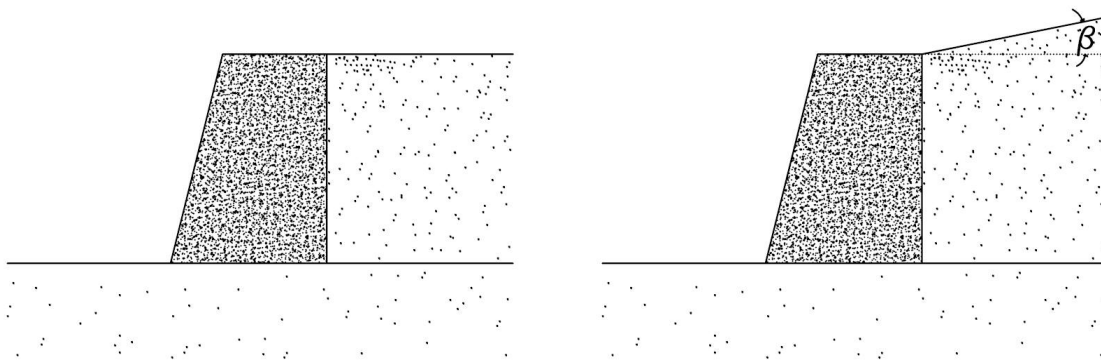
Gravity wall with no backfill slope (left) and with backfill slope angle β
